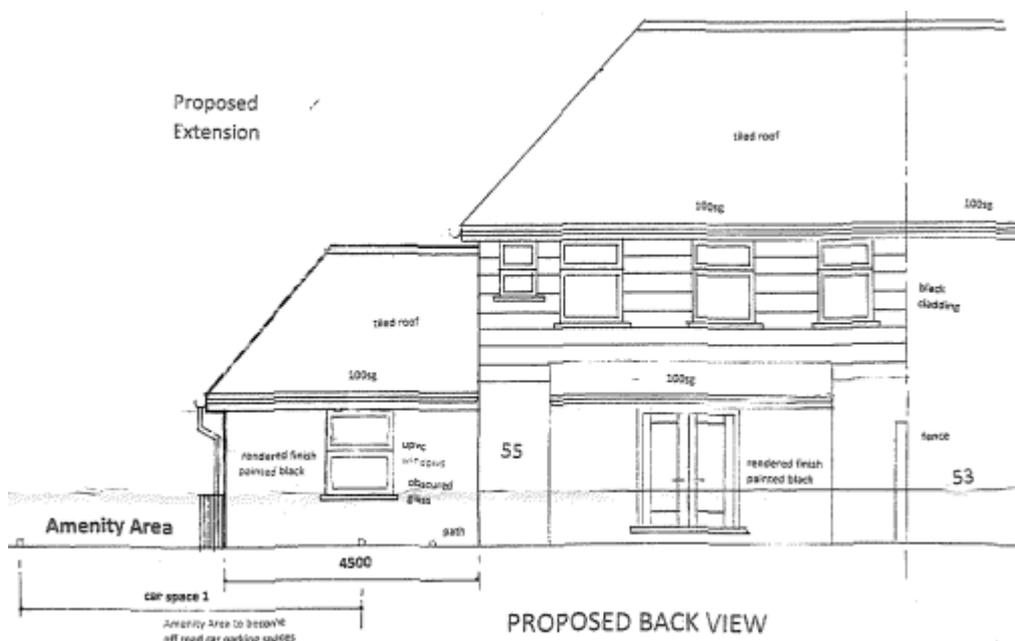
Proposed Rear Elevation (Proposed and Existing Floor and Elevations)
